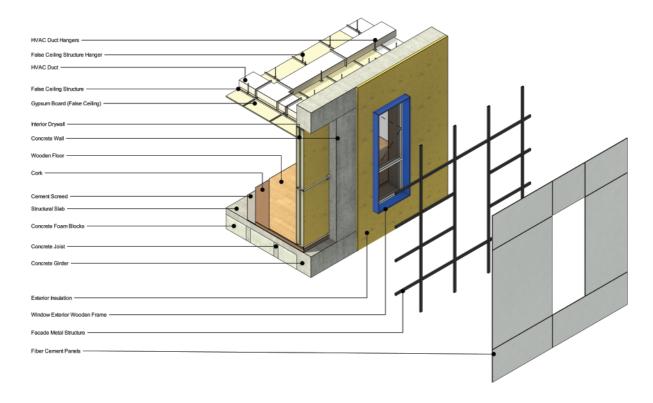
Selected classroom Wall and Facade Detail, Elaborated by authors
